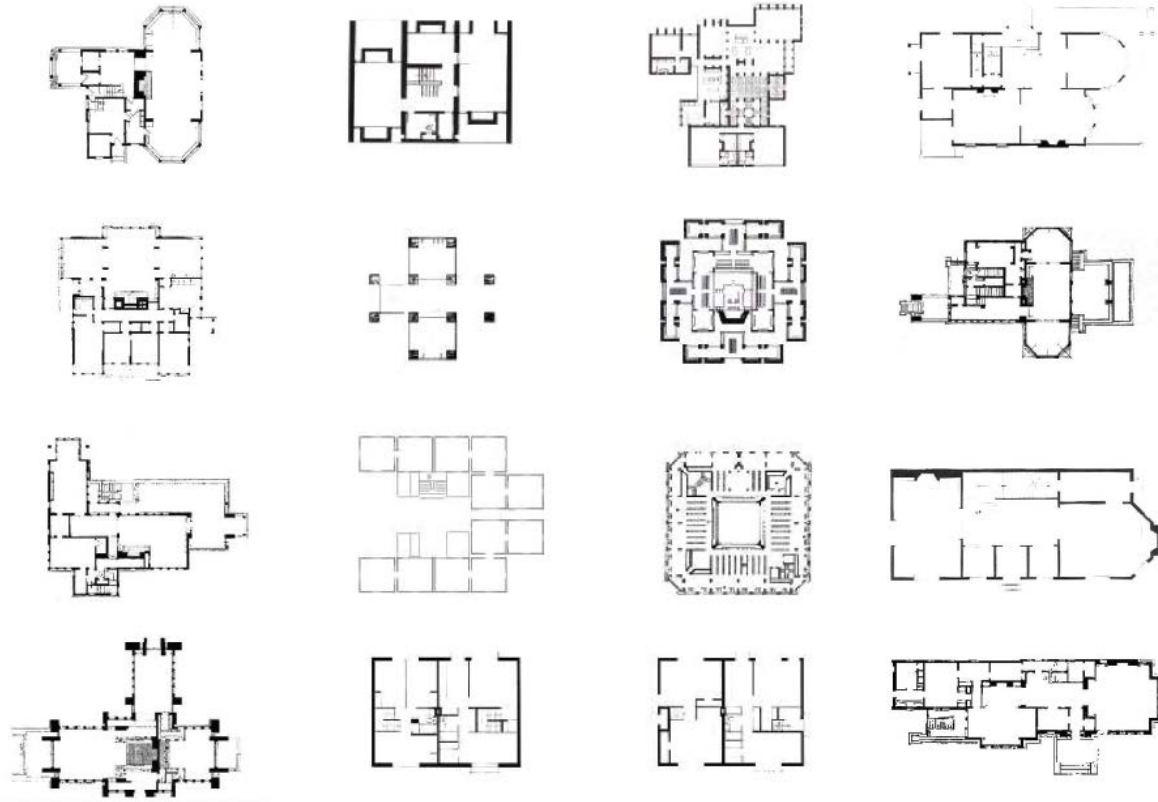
A sample of 16 floor plans from the full set of 54 plans by Palladio, Lloyd Wright and Khan (source: (Jupp, 2005))
